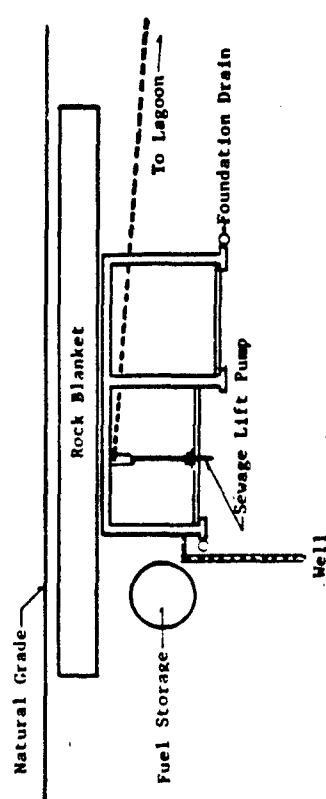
SECTION--BELOW-GRADE CONSTRUCTION.
